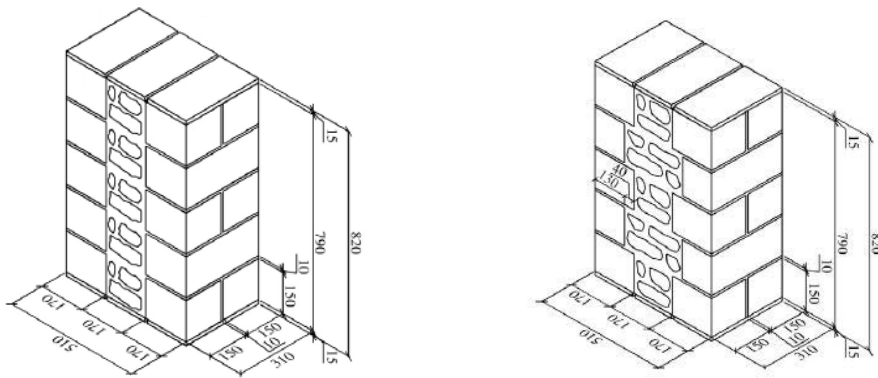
Wall specimen for compression test (Zeng 2010)
